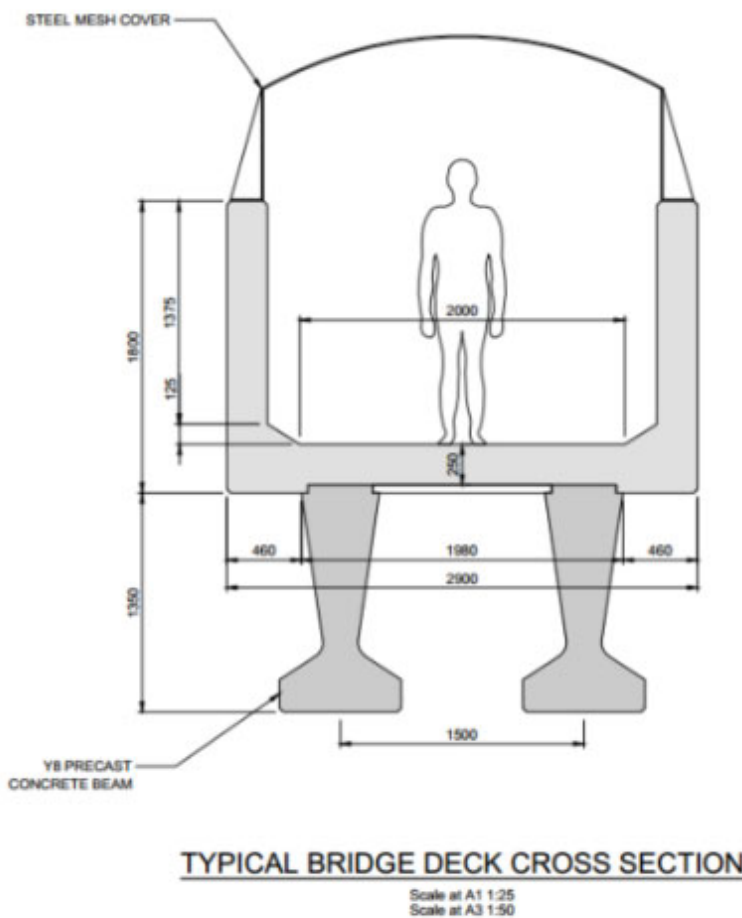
Khyber Pass Footbridge (OBC5) Bridge Deck Cross Section
